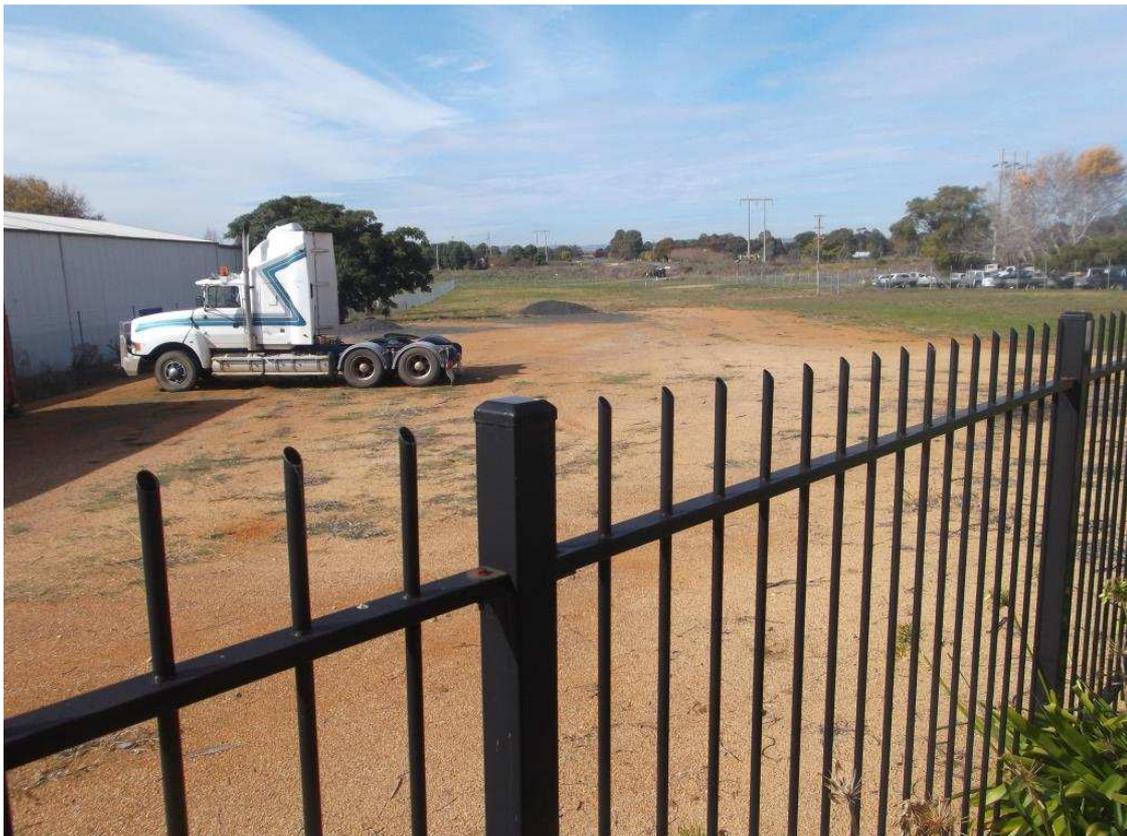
Bypass Route across private land adjacent to Fishburn Street
